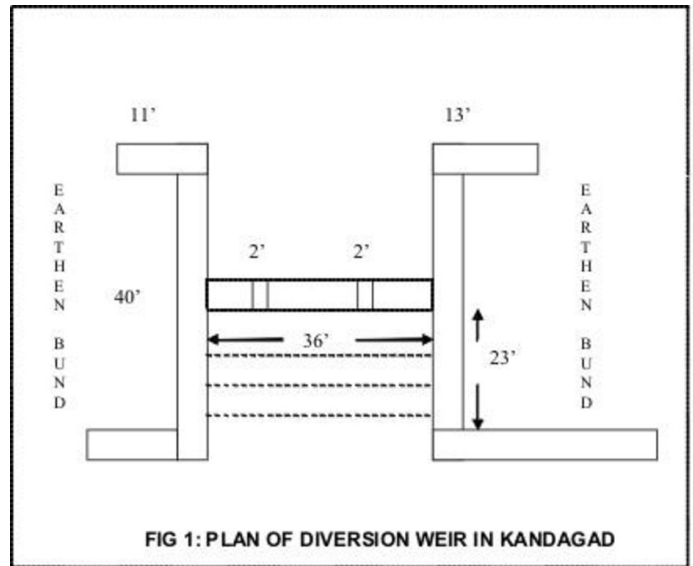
PLAN OF DIVERSION WEIR IN KANDAGAD
